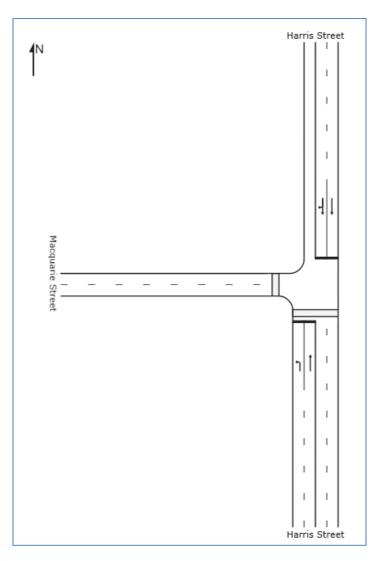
Existing Macquarie Street/Harris Street Intersection Layout
